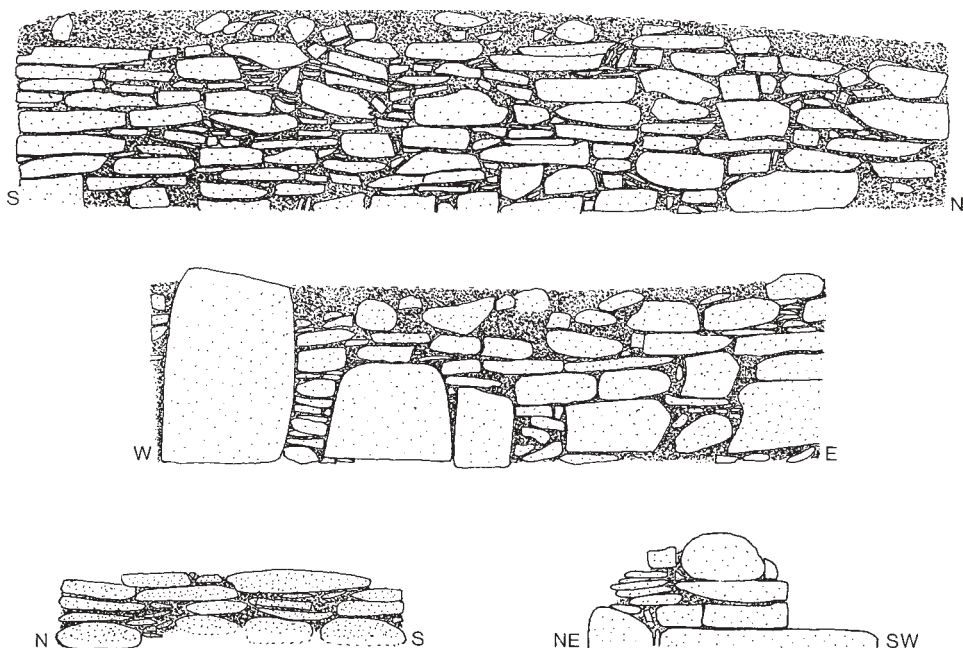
Selected elevations of buildings; top, E. face of division wall in structure A (start 13th C.); centre, part of inner face of N. wall of structure A (early 12th C.); bottom left, W. face of lower courses of altar (12/13th C.); bottom right, surviving portion of outer face N.W. wall of structure K3 (11th C.). Scale c.1:40
